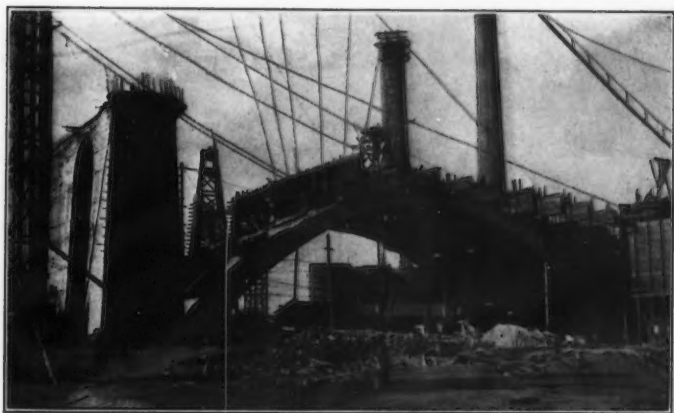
MAIN STREET VIADUCT: FORMING DECK OF SPAN C.
